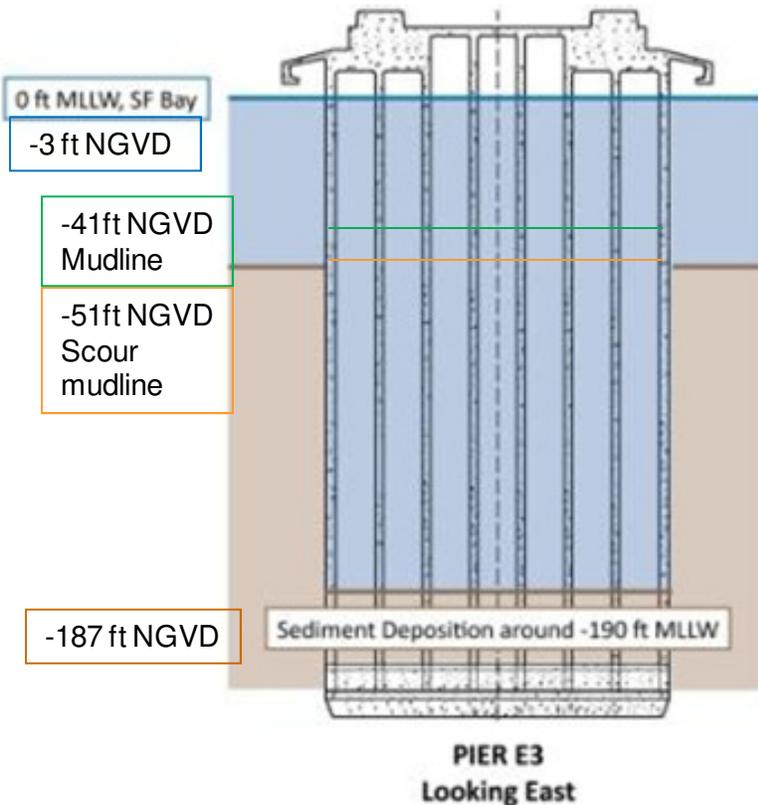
Cross Section of Pier E3 Caissons (Source: Modified from Caltrans, 2014c)
